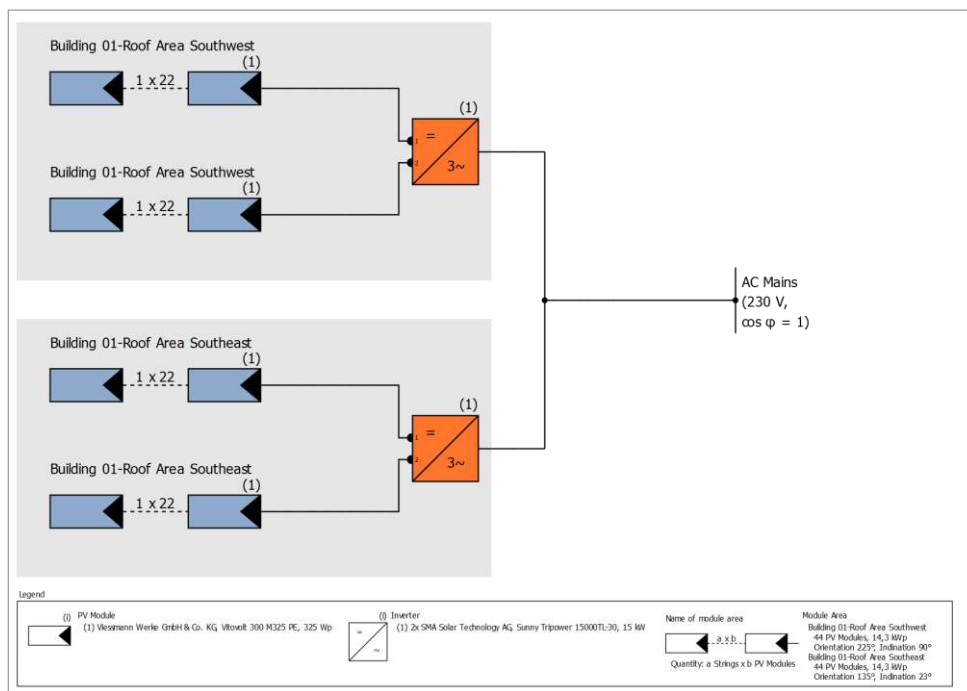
Schematic view of photovoltaic modules connected in strings placed on the roof and façade of a building
